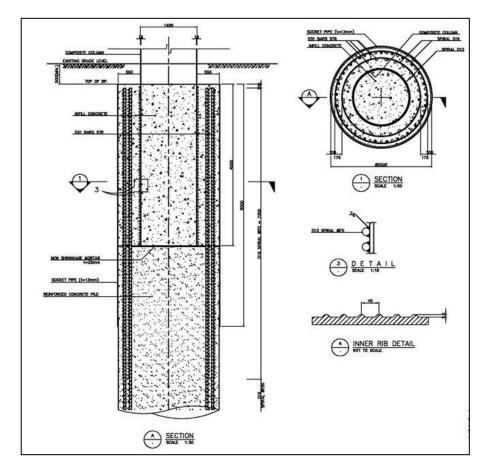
COMPOSITE COLUMN SOCKET TYPE CONNECTION
